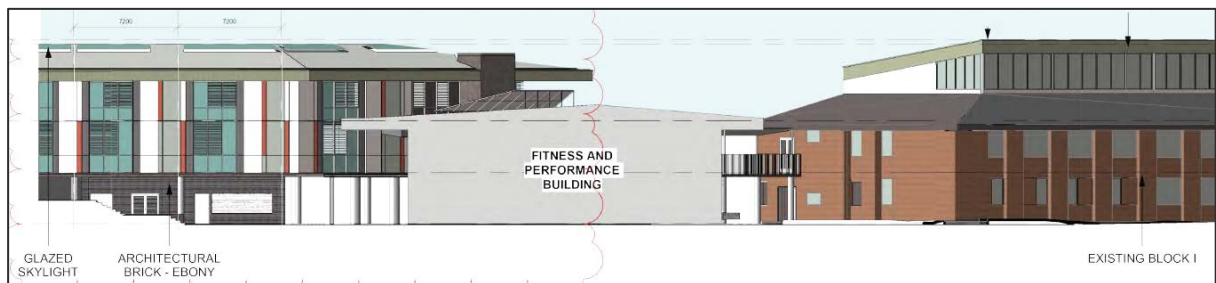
| Proposed southern elevation of main building (eastern side) (source: Section 4.55 Modification Application, 2019)
